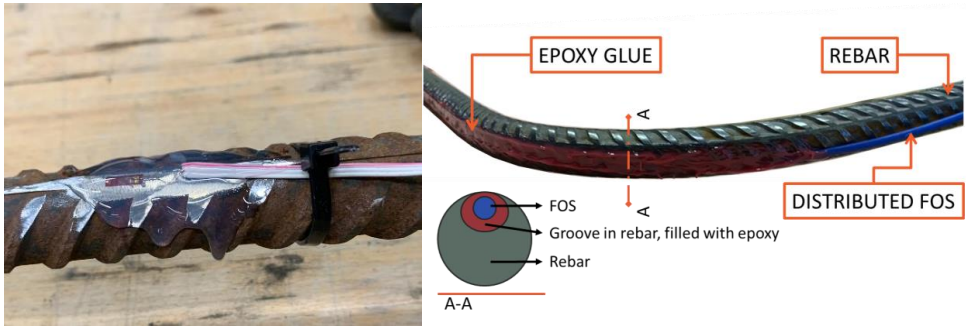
Trough Bridge instrumentation: strain gauge in rebar (left), FOS bonded into groove (right).
